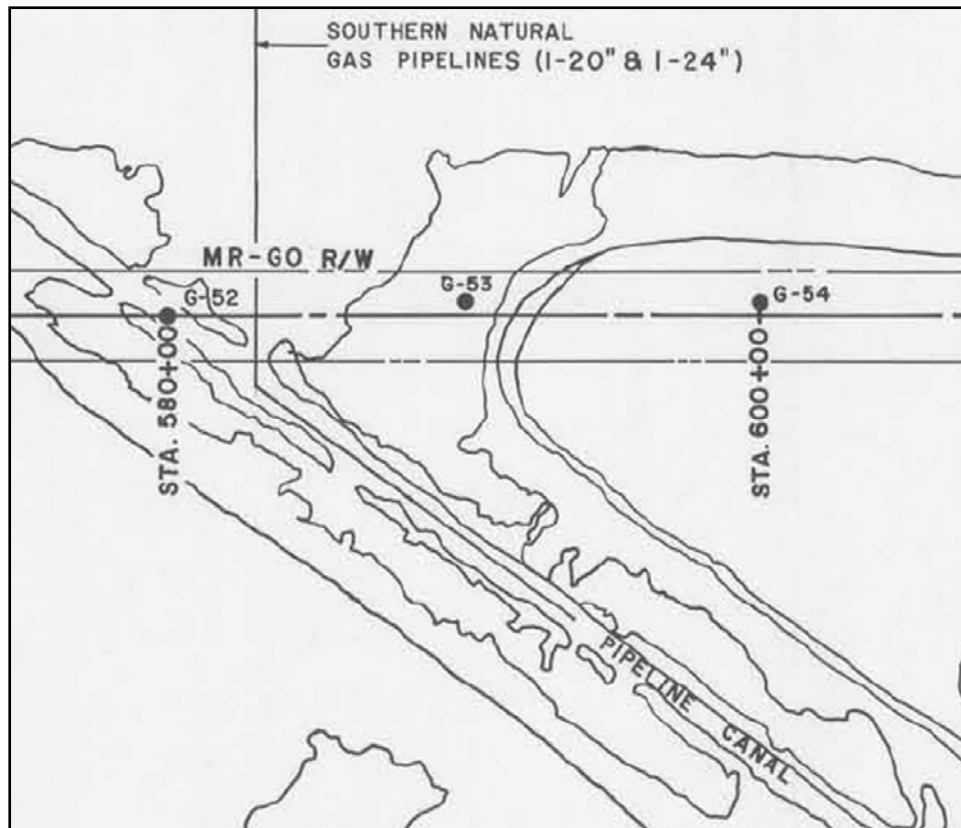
Original Pipeline Canal Prior to Backfilling and Sheetpile (From Drawing File H-2-23820, Plate 13)
